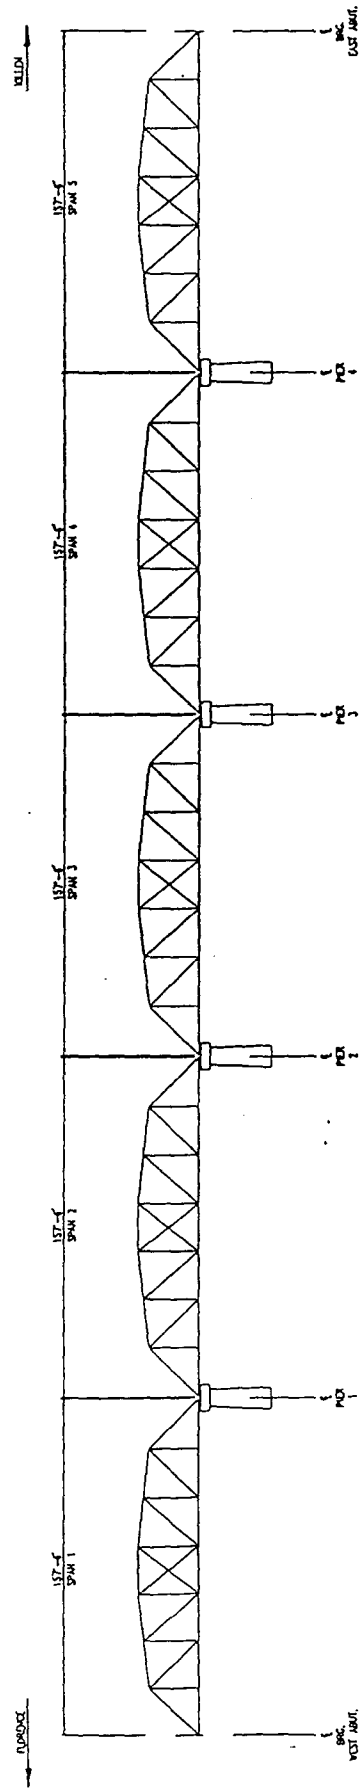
South Elevation of Shoal Creek Bridge (002-39-008.7A)
